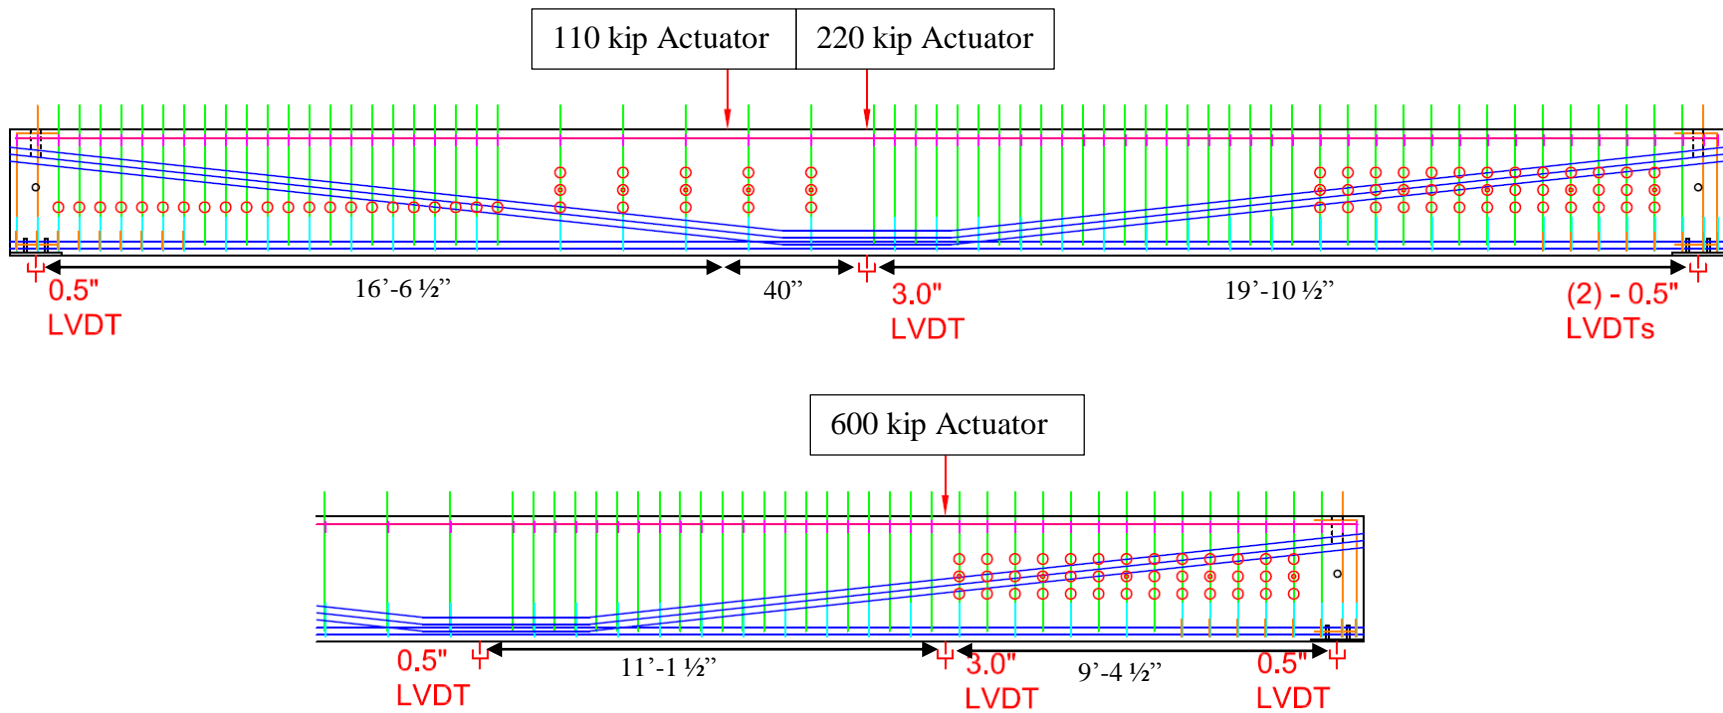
LVDT locations for the first (top) and second (bottom) tests on the 36M prestressed concrete girder.
